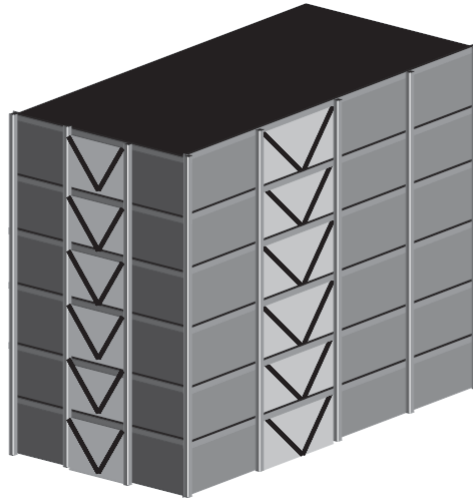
Axonometric view of the layout of steel braces added to frames in model “Gregor”
